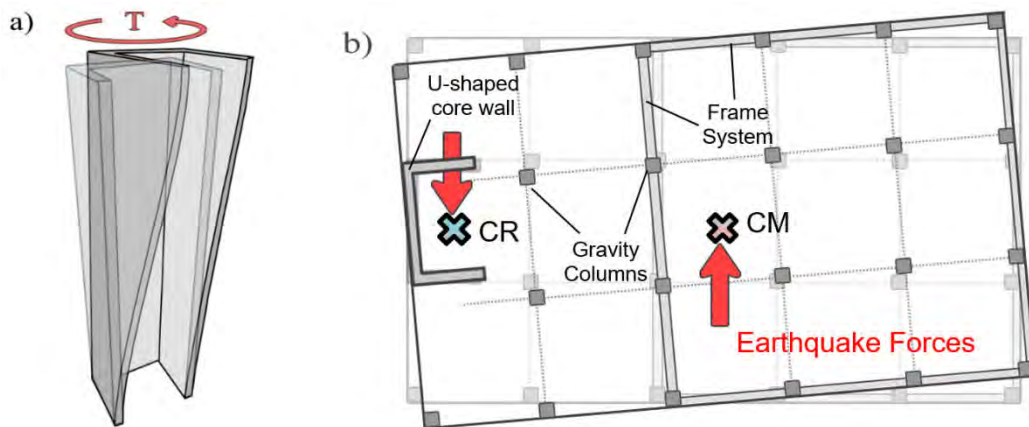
(a) U-shaped core wall subjected to torsion (T), and (b) floor layout of asymmetric building with peripheral U-shaped core wall (centre of rigidity [CR], or stiffness, is offset from the centre of mass [CM])
